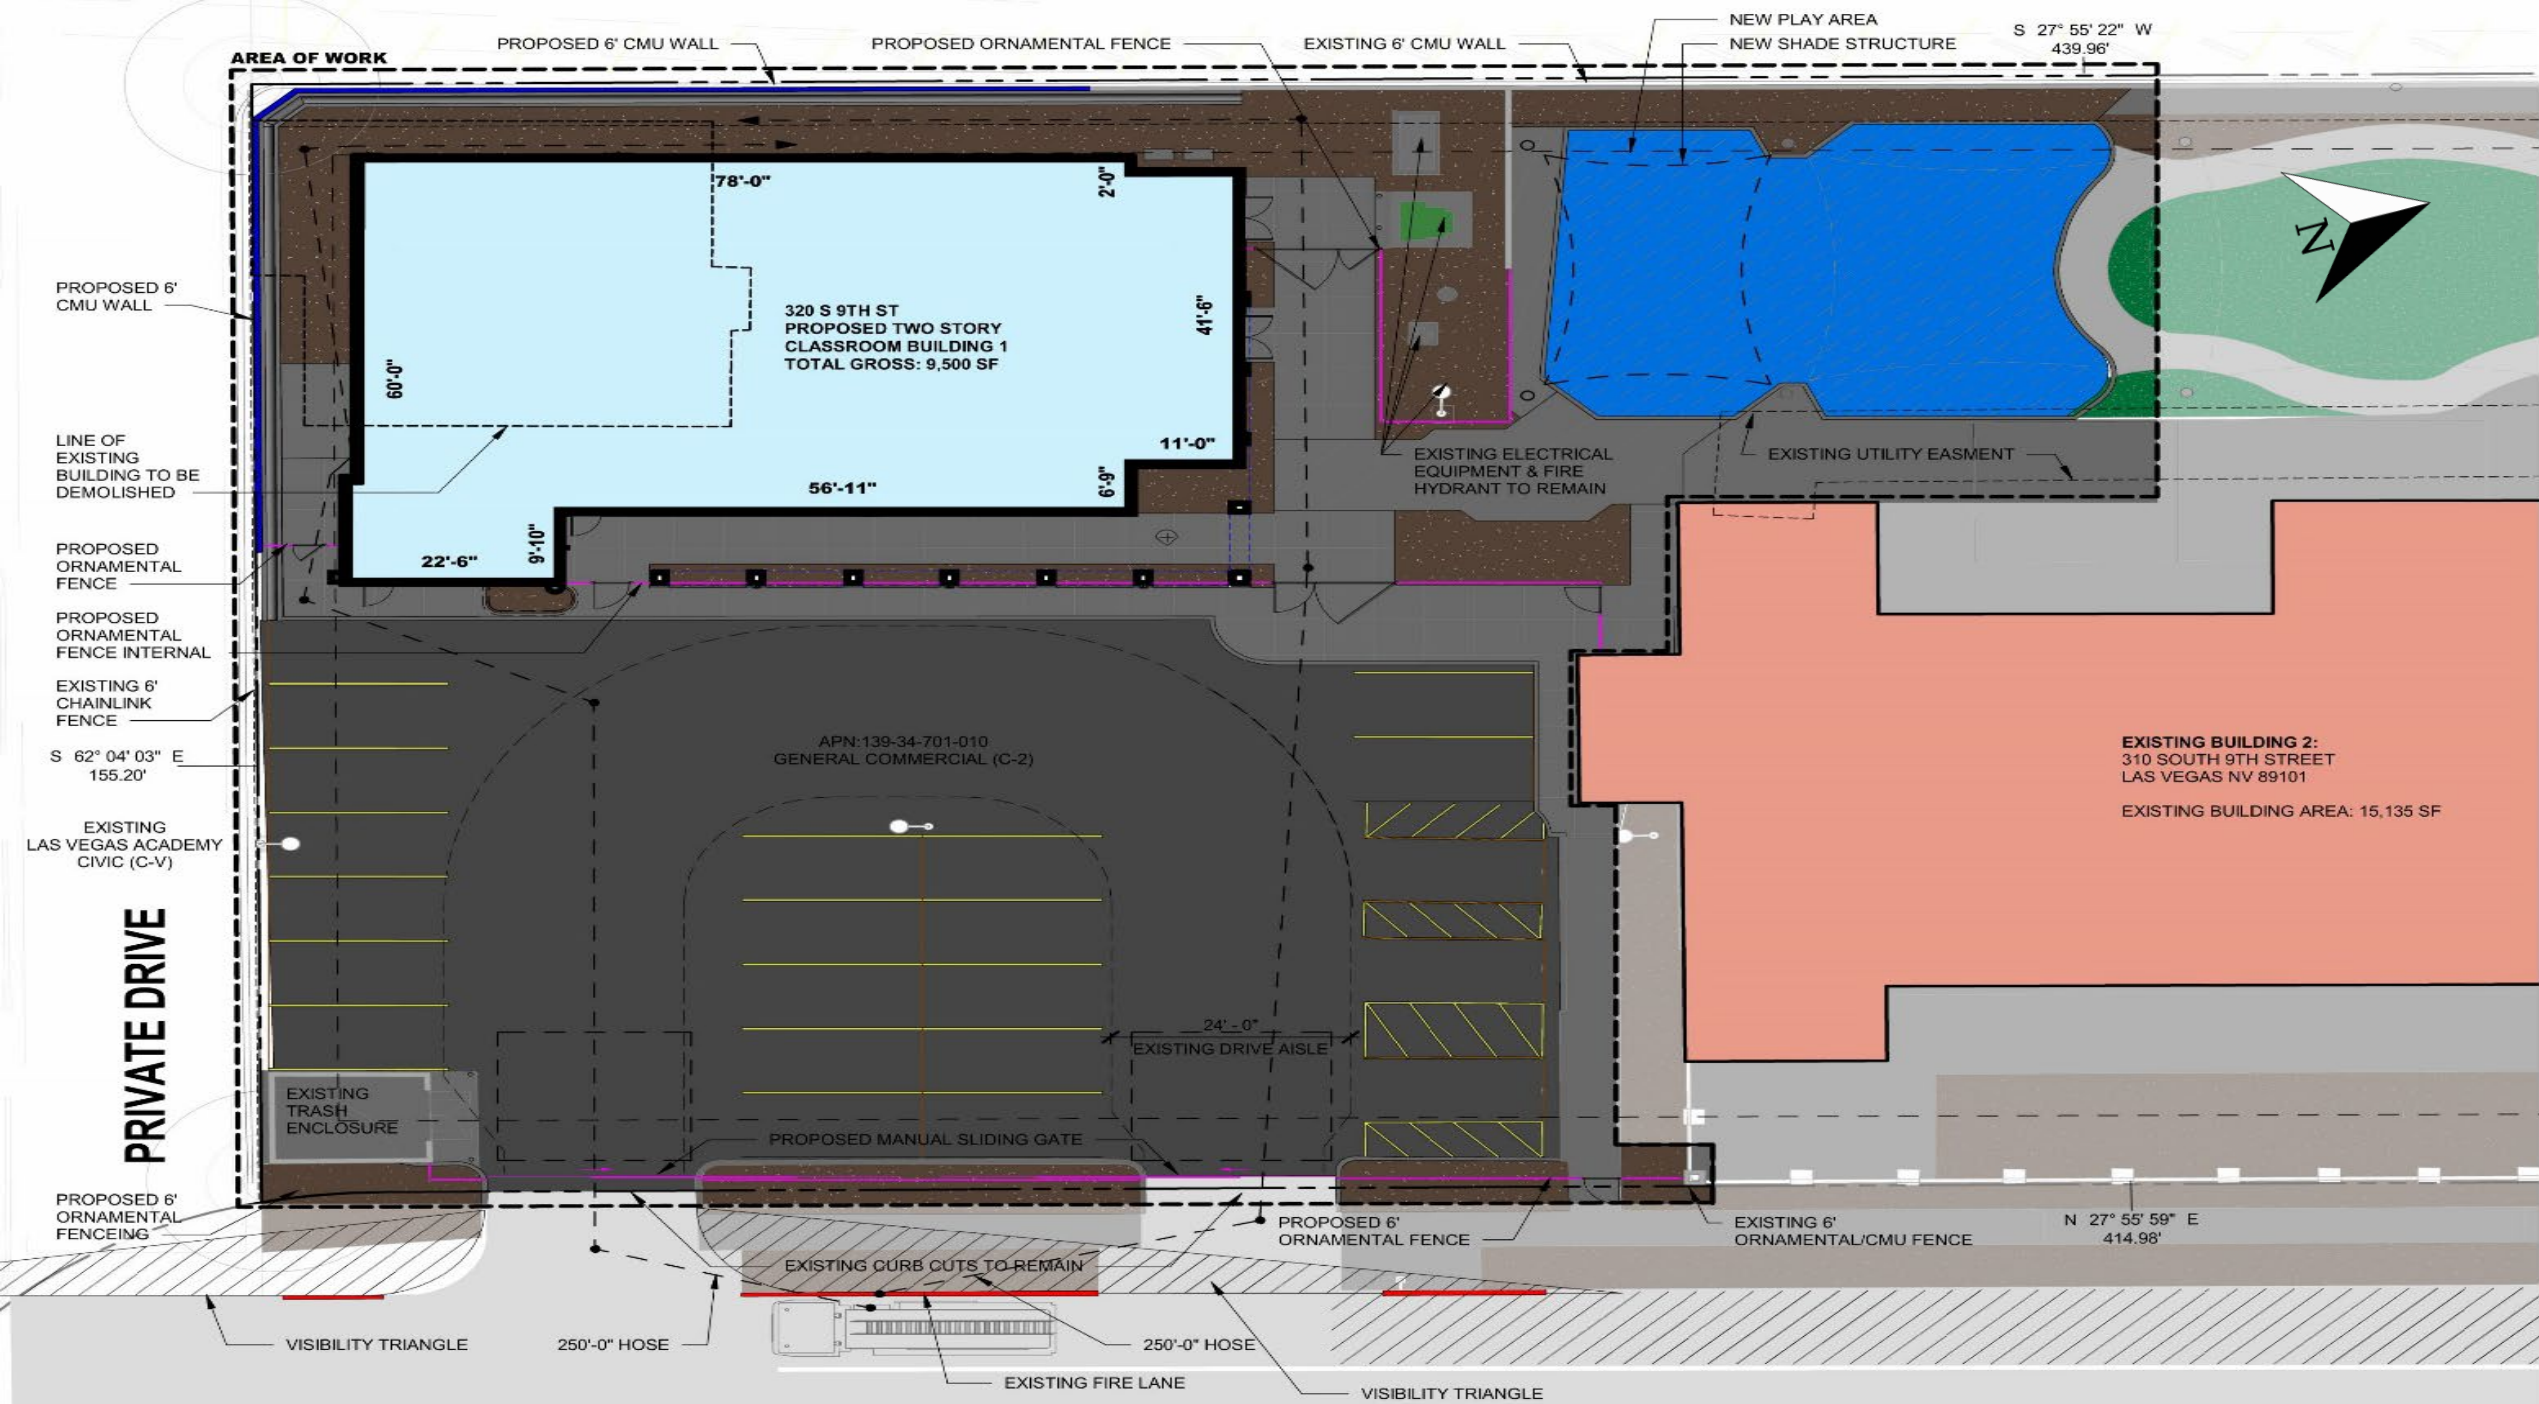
Rendering of new Strong Start two story classroom Building 1.
